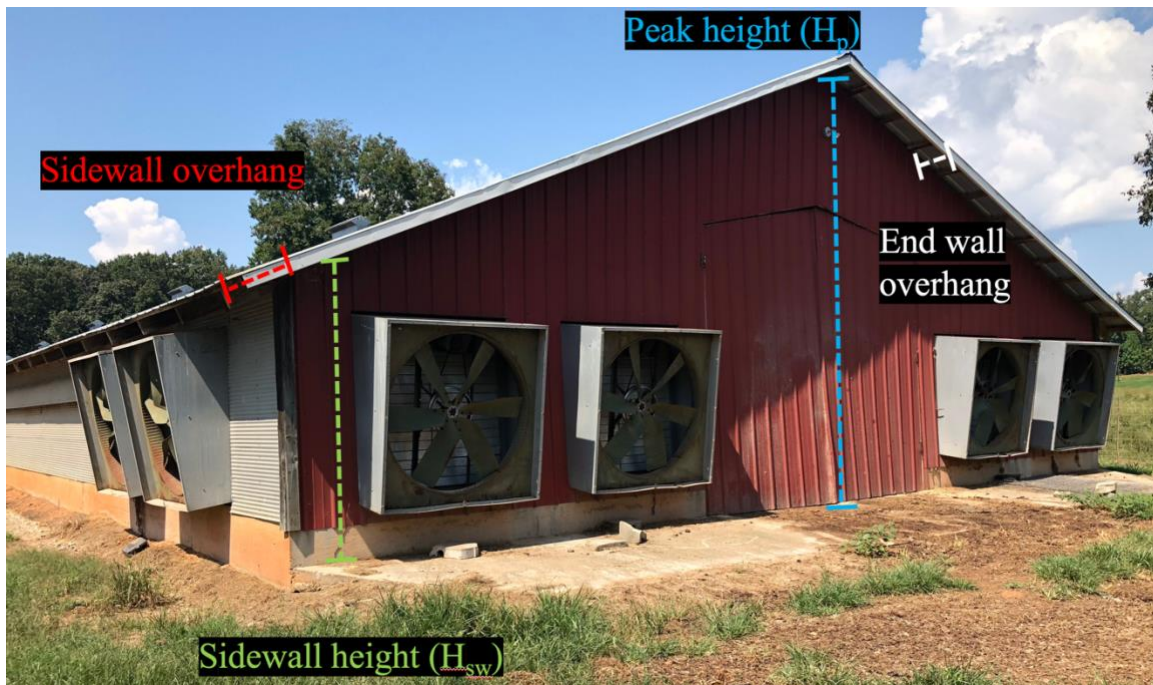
Poultry endwall illustrating location of sidewall and peak height measurements and building overhangs.
